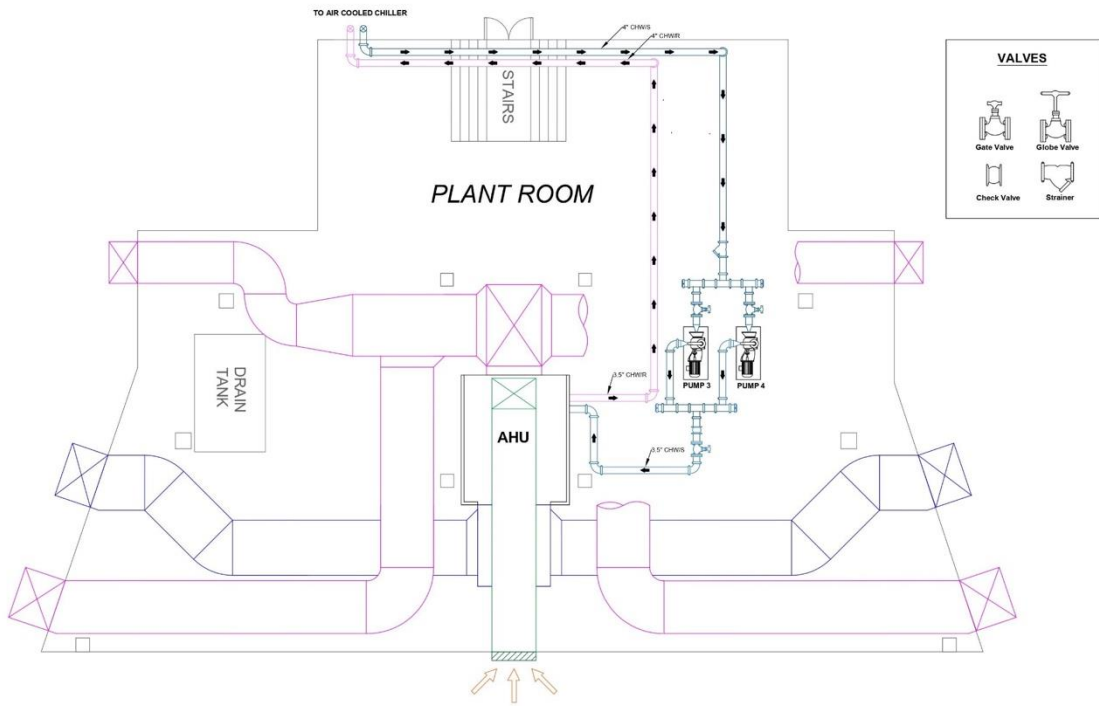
Figure XXIX.- Pipe Layout of Plant Room for Proposed System # 1
